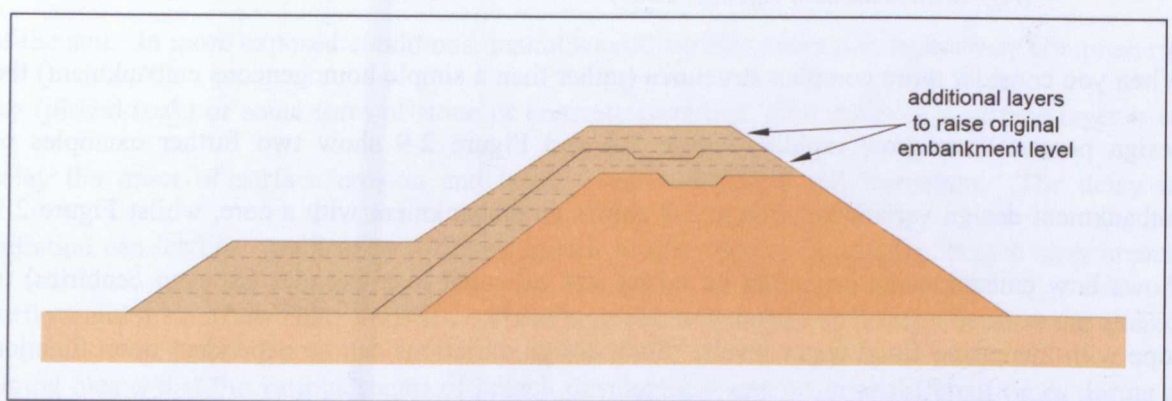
Composite embankment – earth embankment built progressively with additional layers or zones of soil
